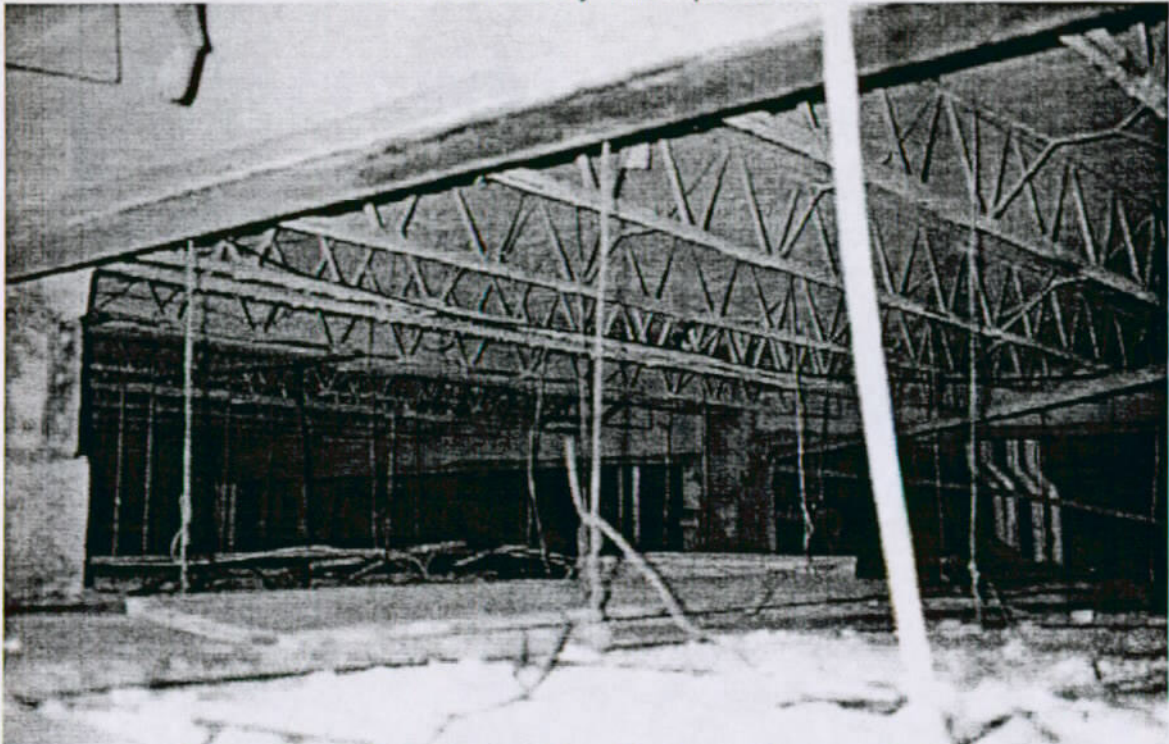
Suspended Metal Lath and Plaster Ceilings
